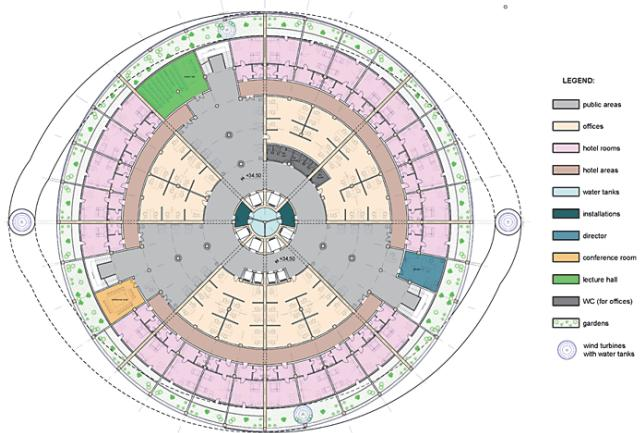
Architectural typical floor plan (Aleksandrov et al., 2014b)
